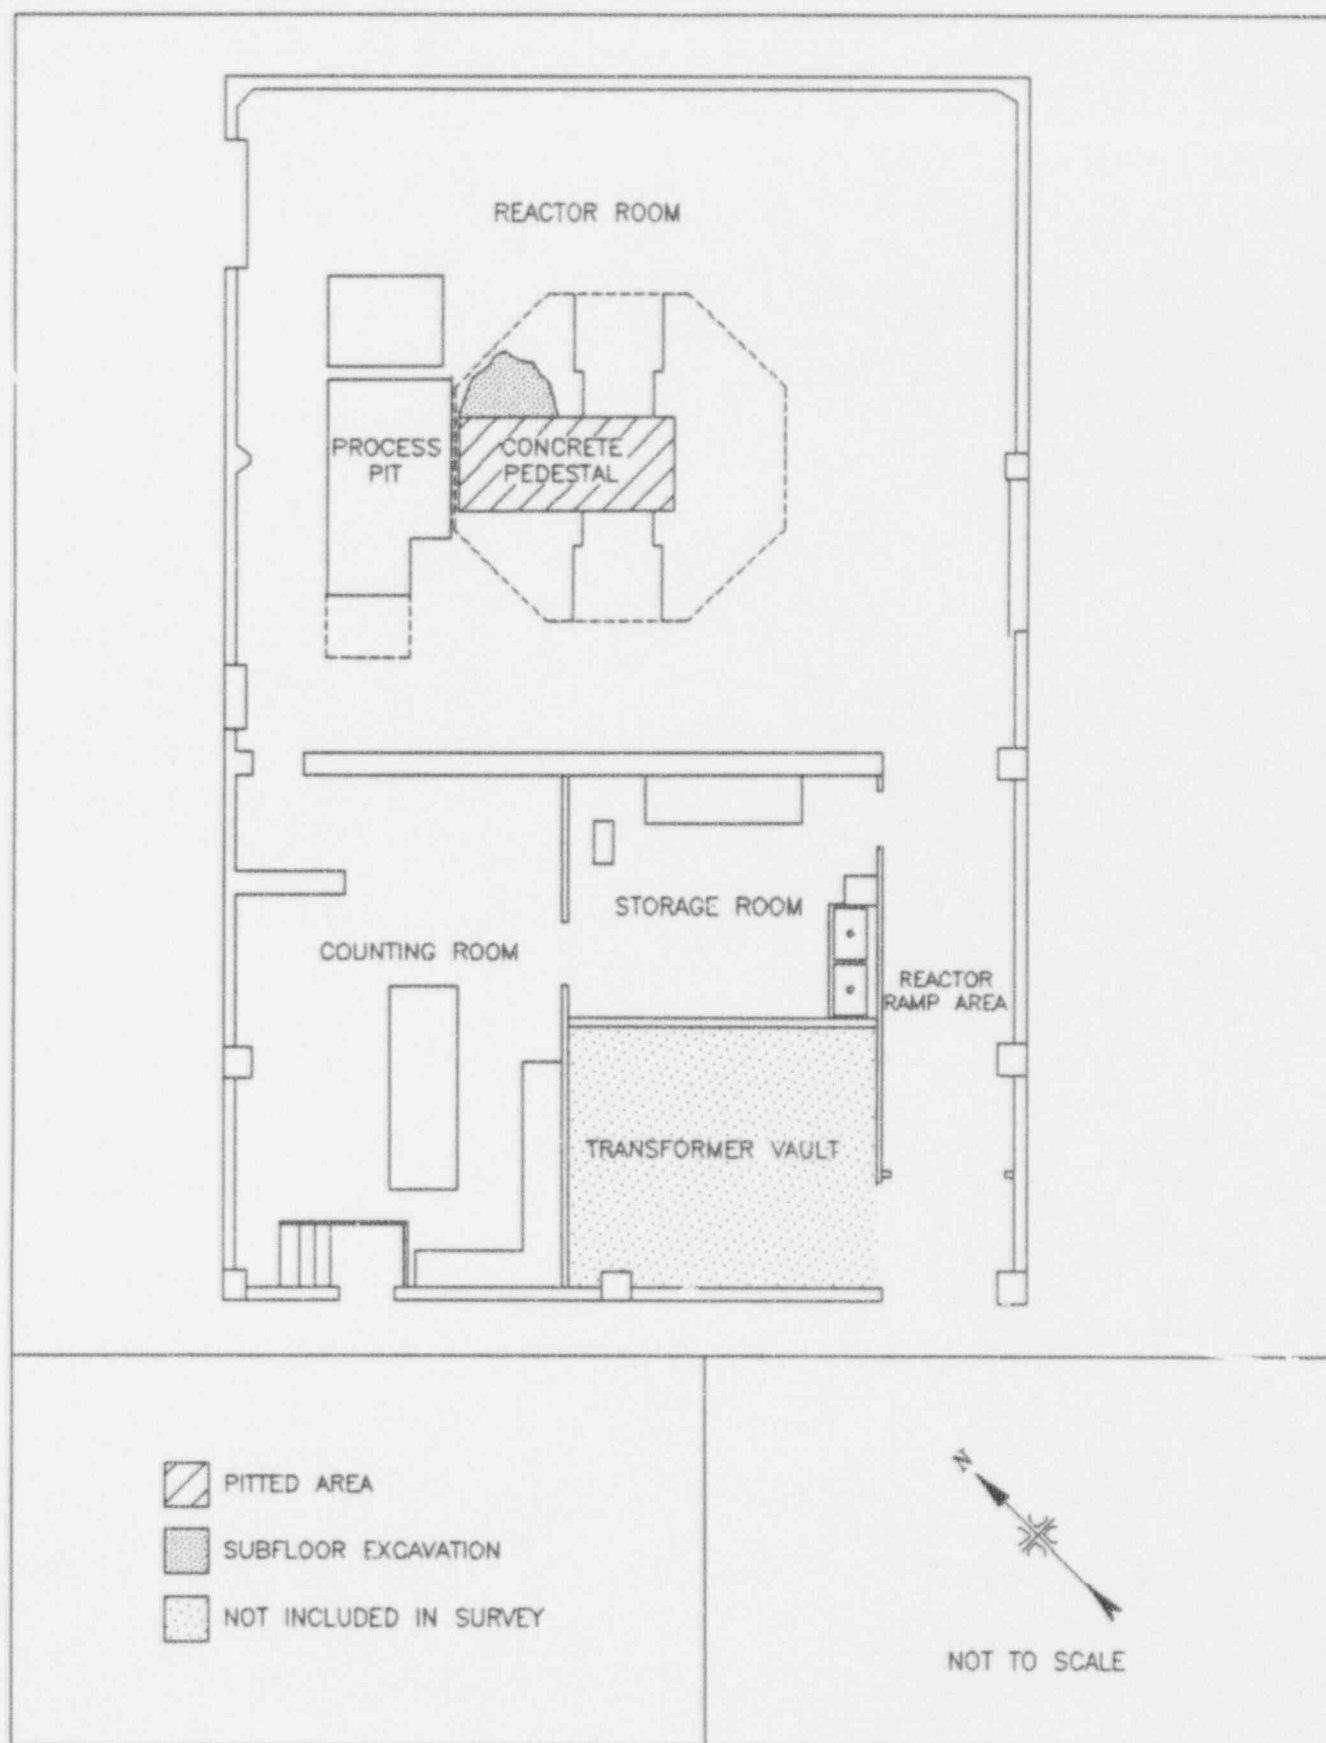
Boelter Reactor Facility, Plot Plan of Ground Floor
